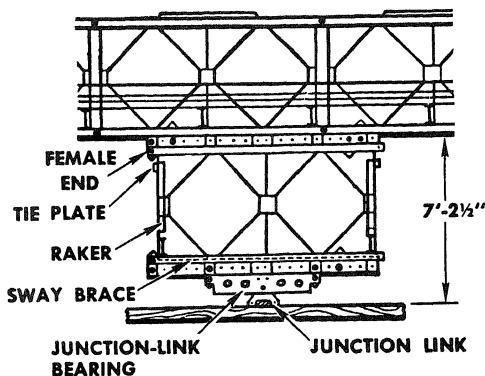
Single-story single-bay crib with panels horizontal. Continuous bridge with rocker bearing at base of crib using junction-link bearings.
